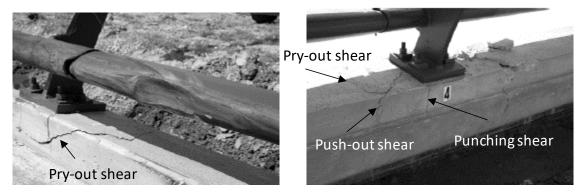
Concrete damage modes experienced in NCHRP Report 350 Test 3-11 on the TxDOT T77 bridge rail.
